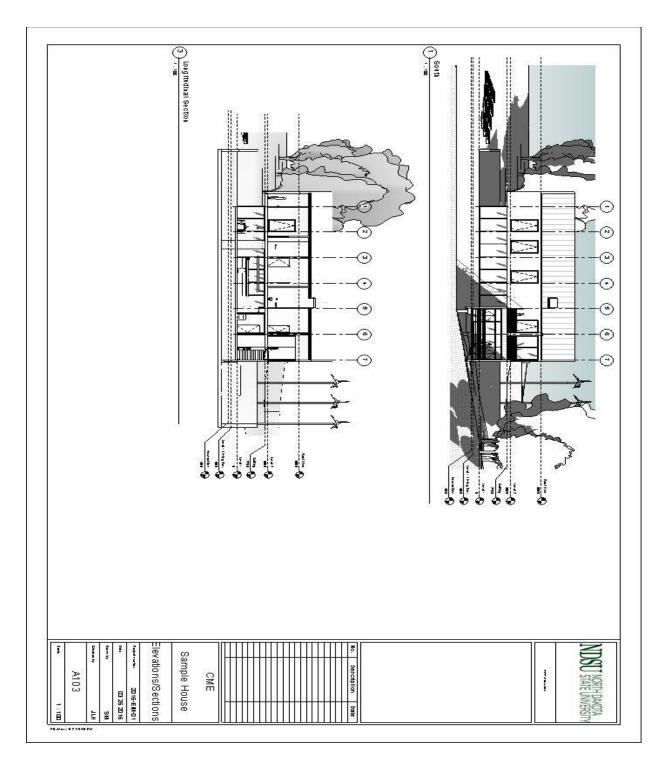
Sample BIM: Elevations & Sections [Landscape]
